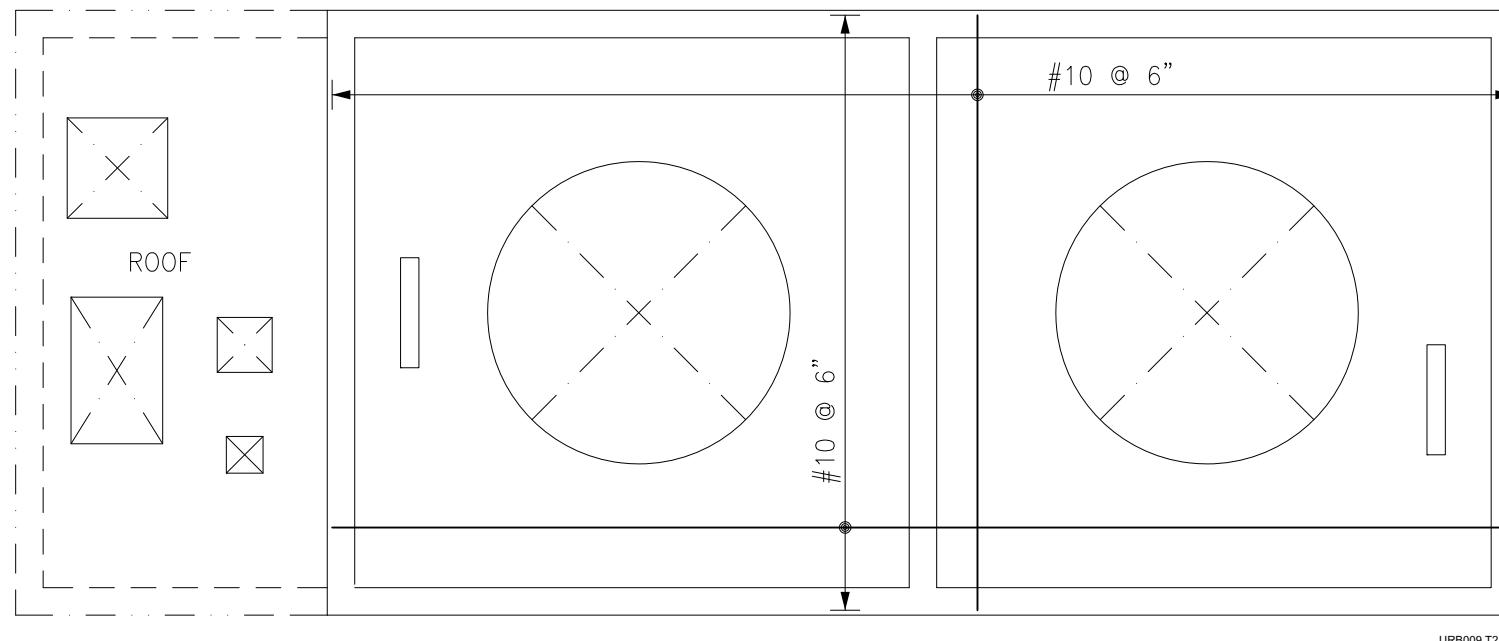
E.3-7—Reinforcement Configuration for ESWB Wall at Column Line 4
